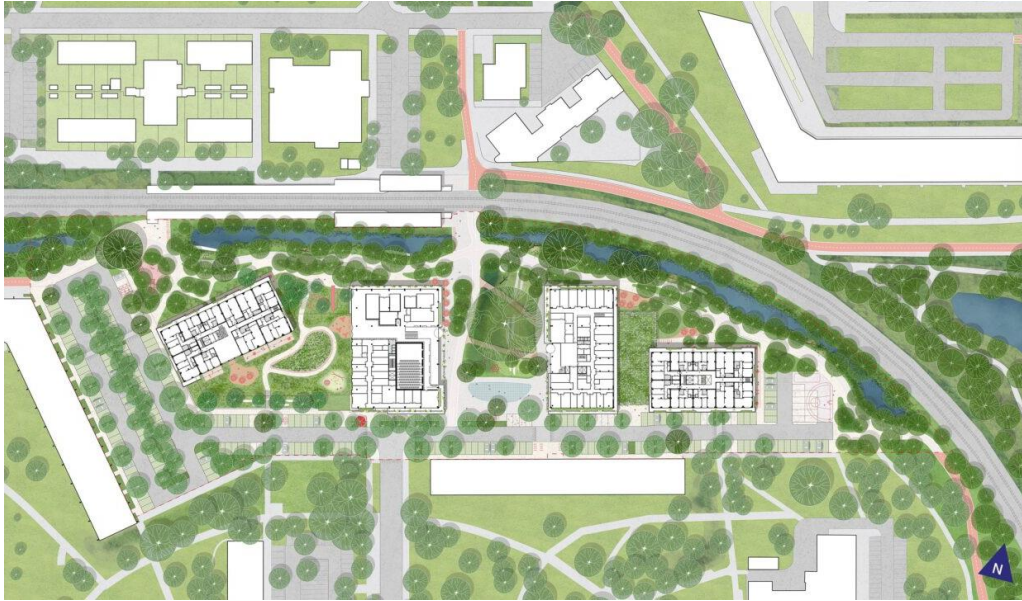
Plan of project Populus from LEVS Architects (LEVS, 2024)
